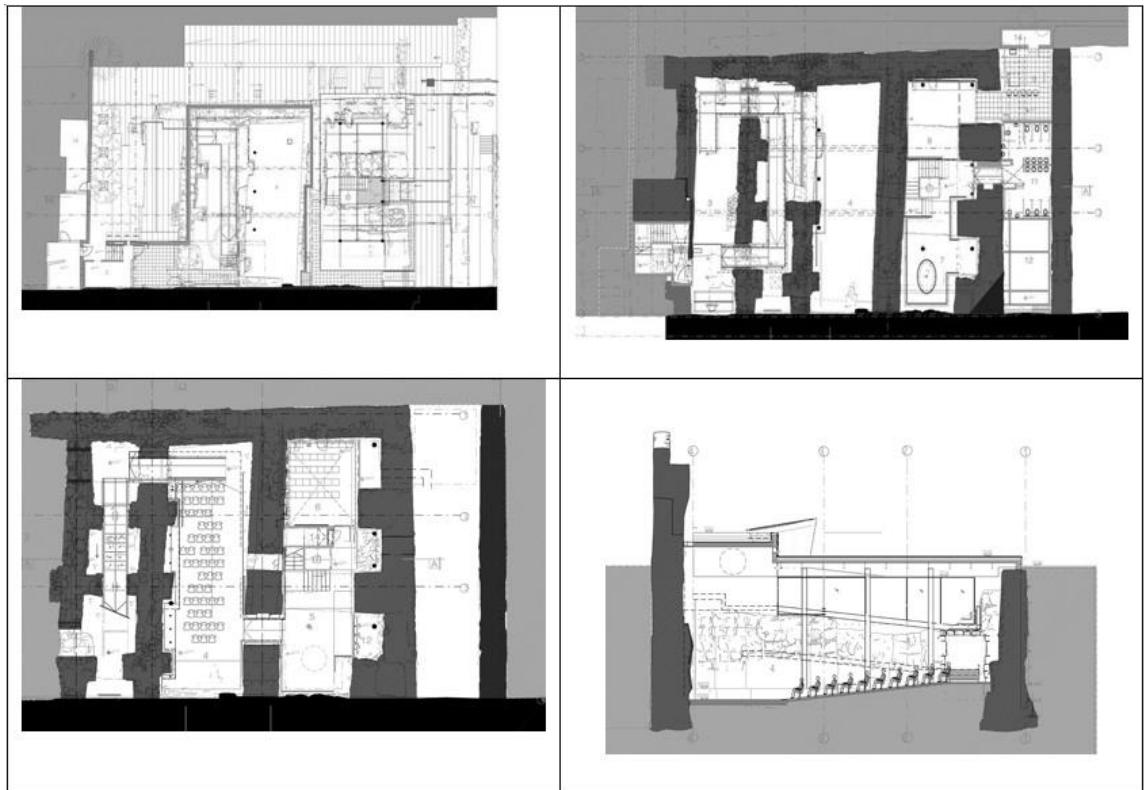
The underground planning of the museum, showing the different layers that have been built (Source: Kimmel, 2011)
